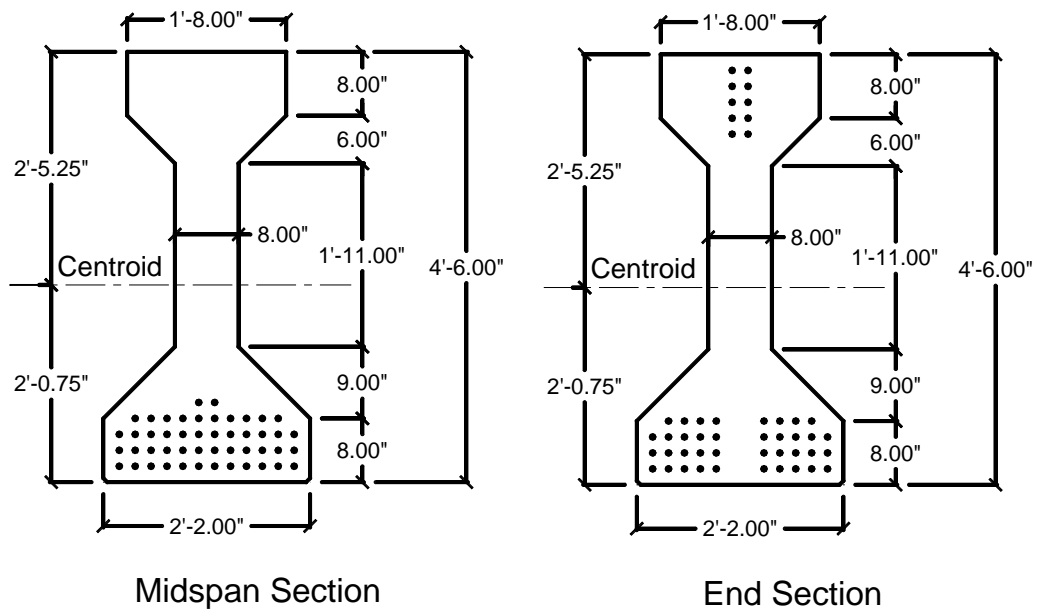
Type C Girders – Willis Creek Bridge
